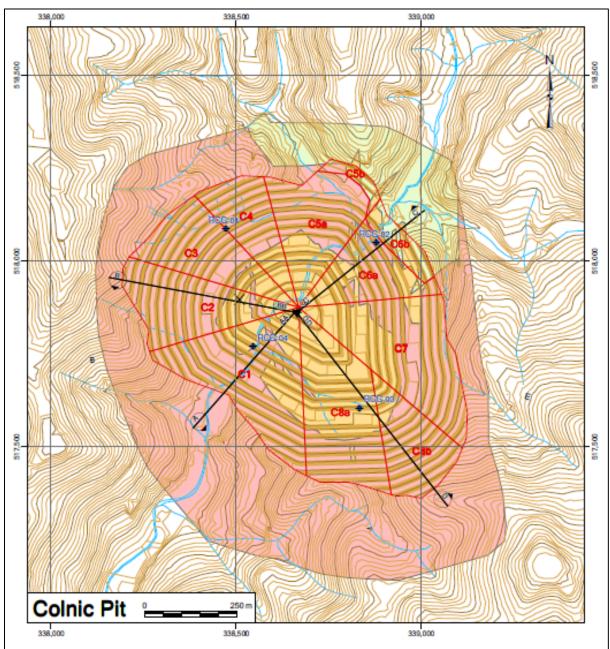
Colnic Pit - Geotechnical Assessment of Design Sectors
